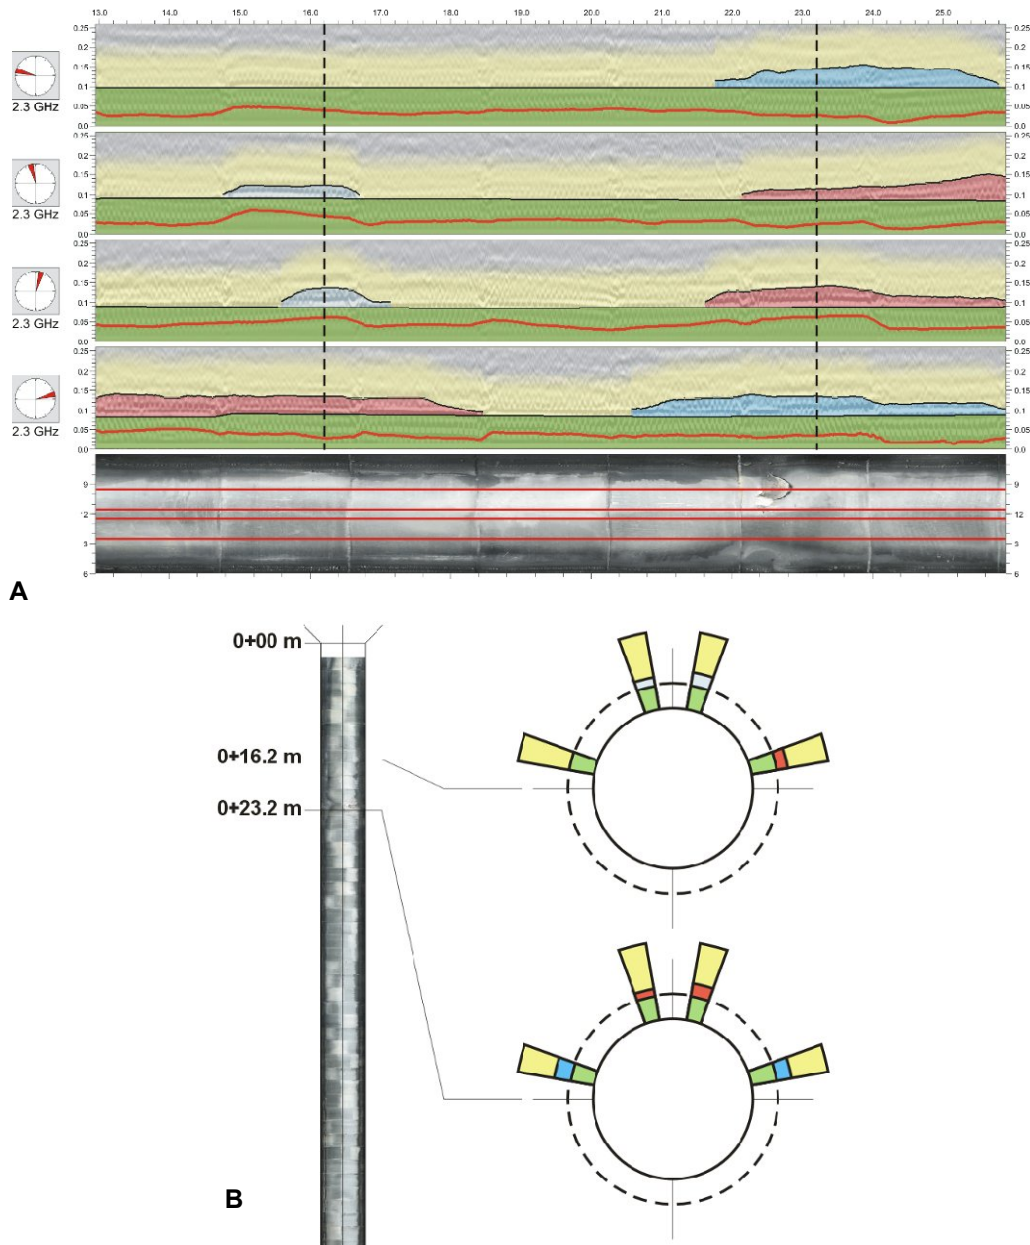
PP RADIAN views of a 30" (750mm) reinforced concrete sewer pipe: A: longitudinal cross sections at multiple clock positions with corresponding CCTV foldout view. B: Cross section view with corresponding CCTV foldout view.
